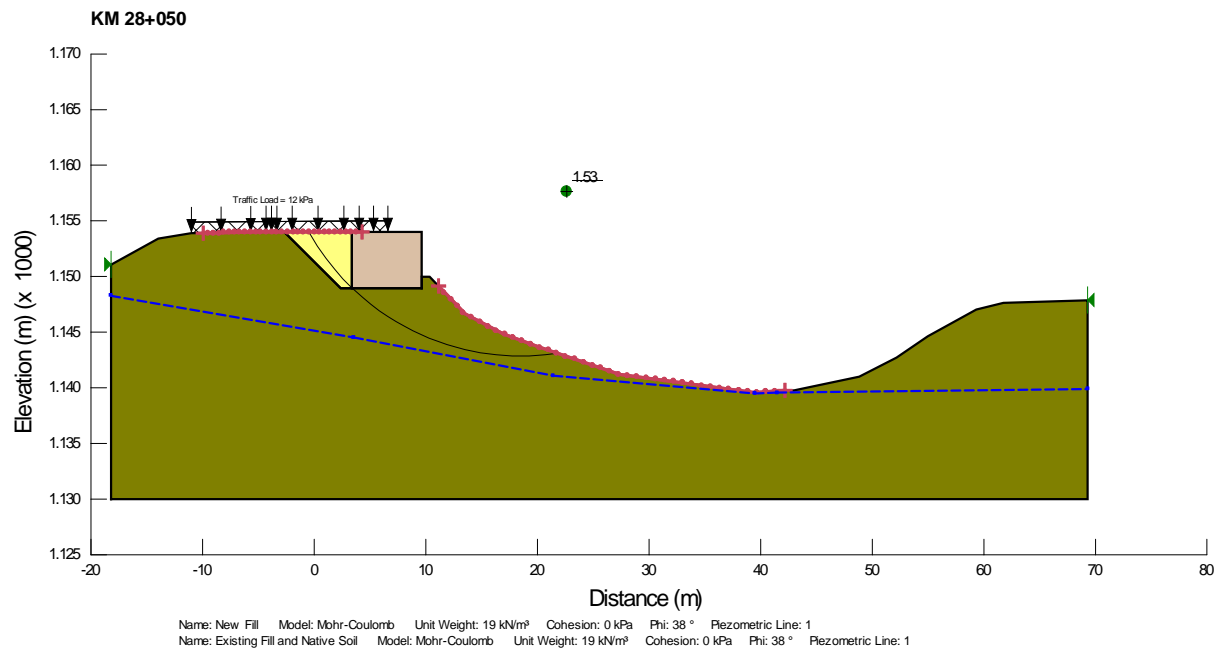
Station 28+050- Local Stability of the Slope after Construction of the Retaining Wall (Retaining Wall Height - 5.0 m, Wall Embedment below Finish Grade - 1.0 m, Reinforcement Length - 6.3 m)
